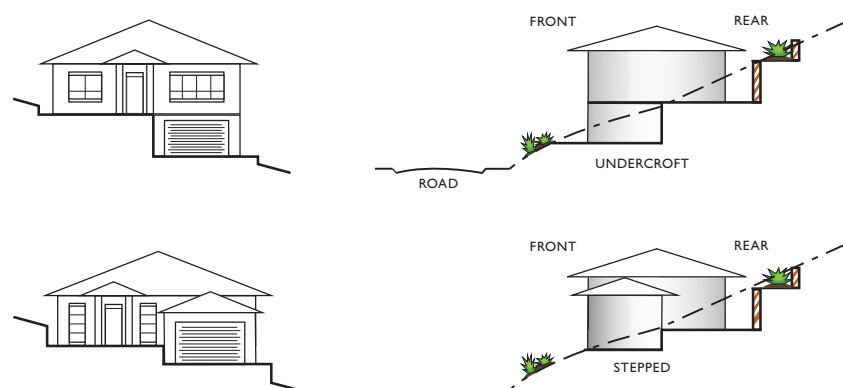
Location where plain grey concrete sleepers are permitted & not permitted
